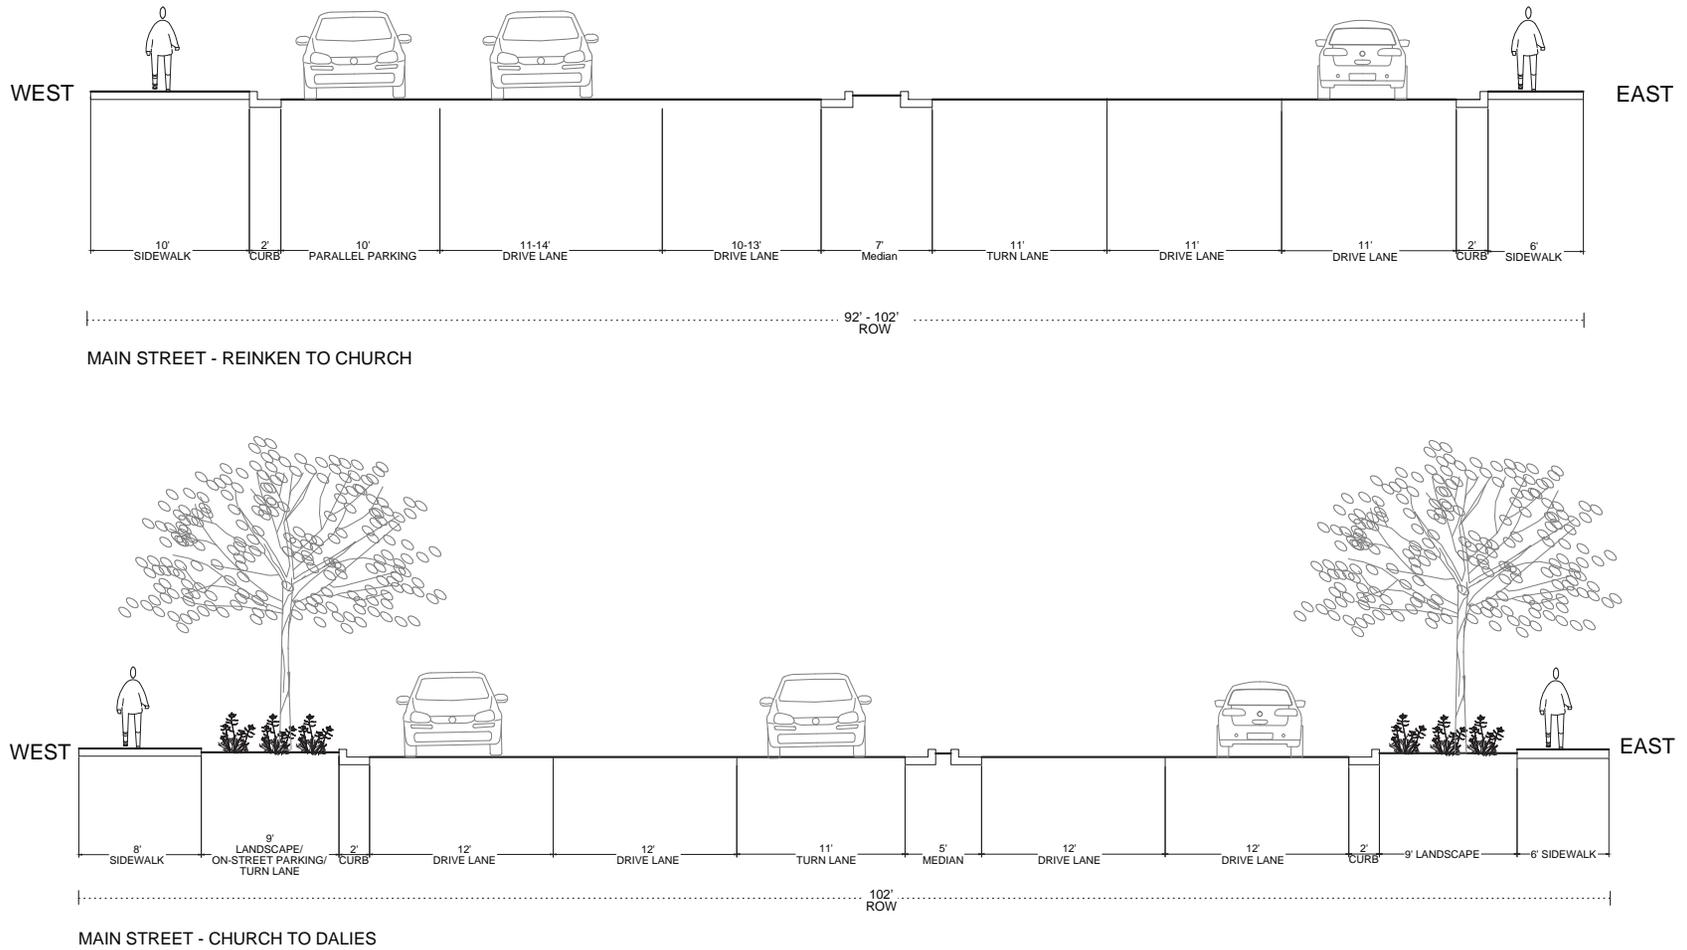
EXISTING ROADWAY SECTIONS, MAIN STREET
